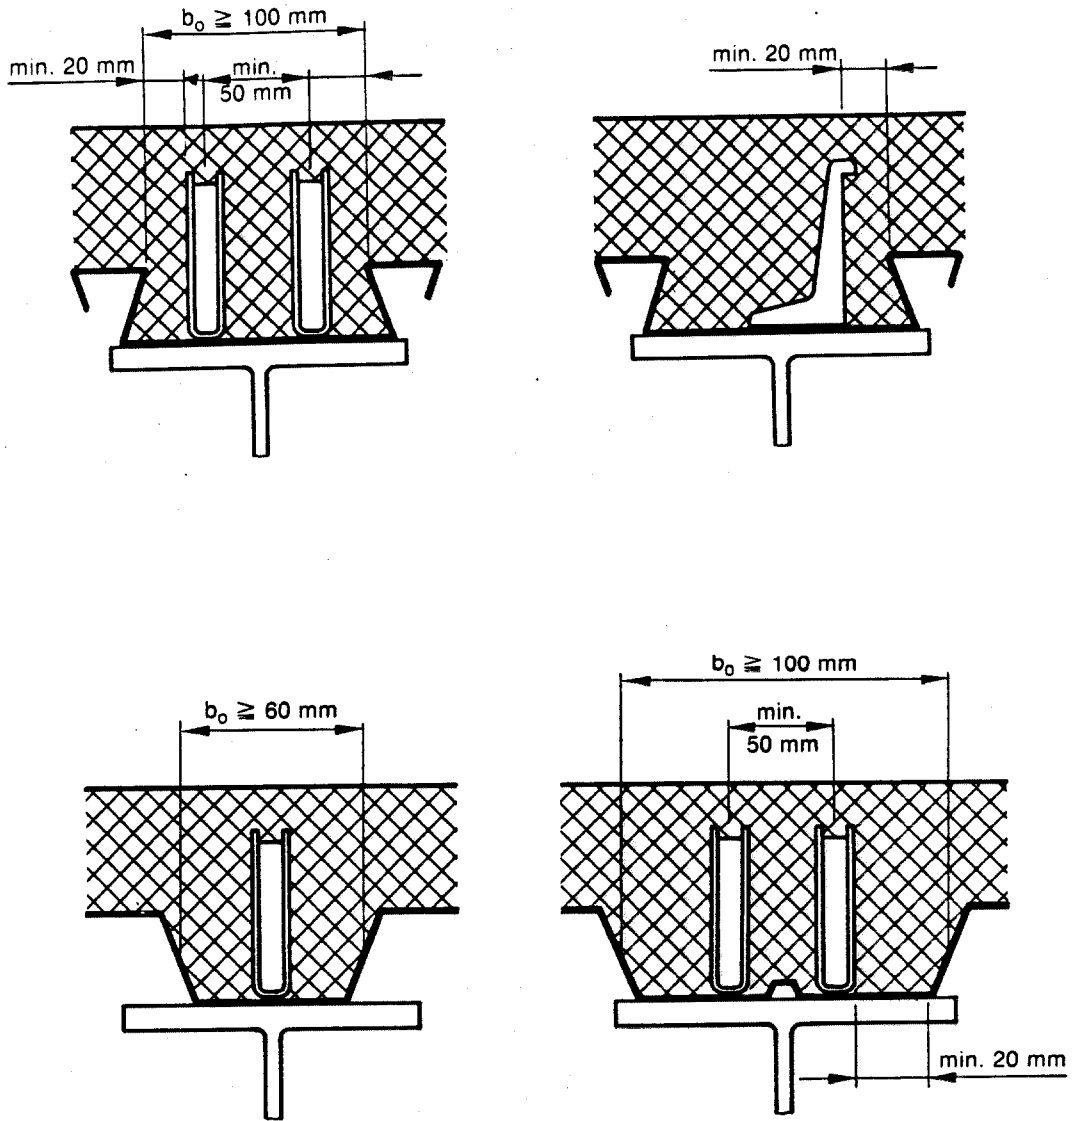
Detailing rules for a compact profiled sheet transverse to the beam
